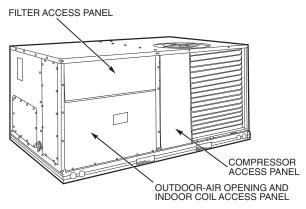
Typical Access Panel Locations (Sizes 090-102)
